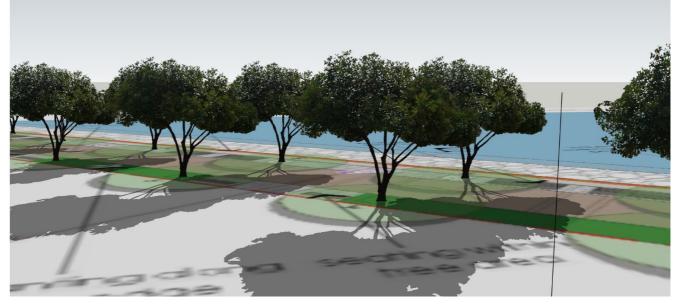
Promenade 10am Winter Shadow (provided by Terras Landscape Architects 2019)
